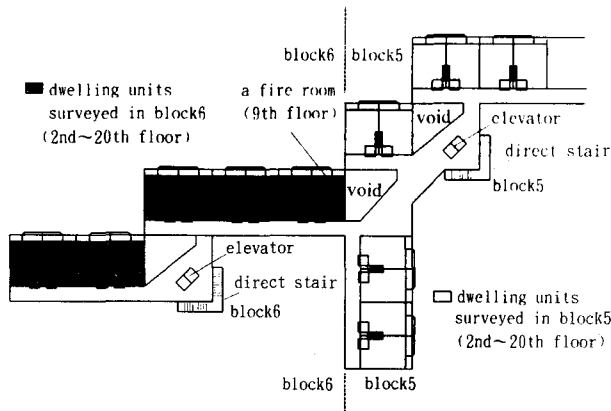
Floor plan of the apartments on even-numbered floors.
